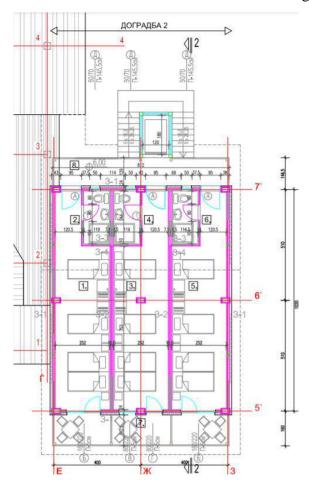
Design of the first floor in extension/addition to existing accommodation facility
